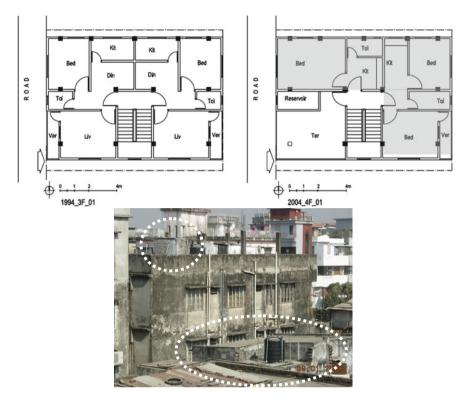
Examples of rooftop additions. Examples showing rooftop additions occupying rear part of the roof, away from the access road (*circle*). *Source* Author
